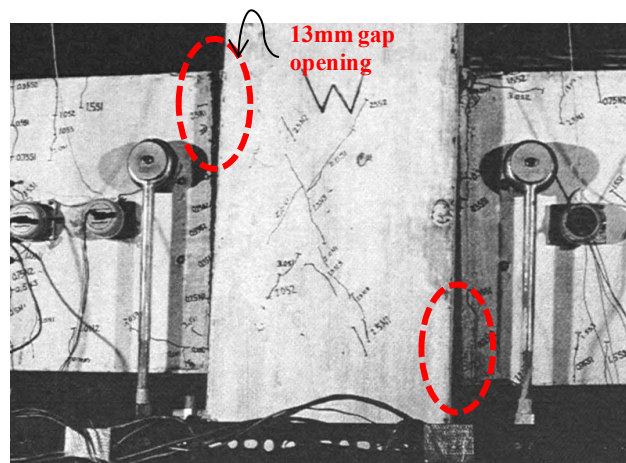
Specimen M-P-Z4 at failure (3.4% drift); from Stone et al. 1995
